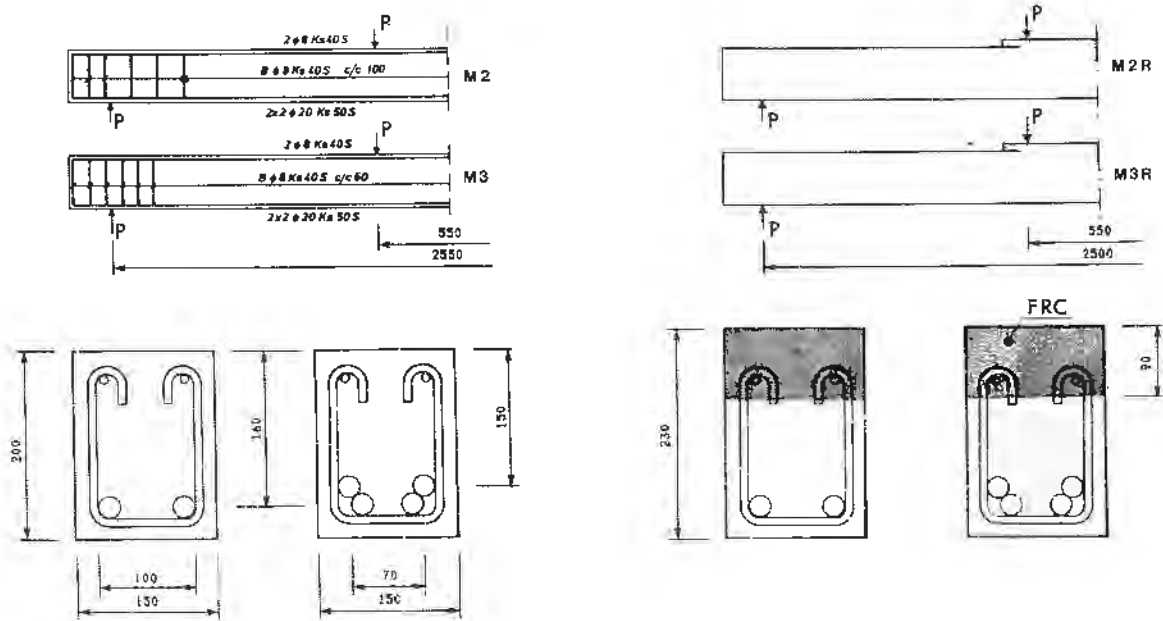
Test beams: a - original beams M2 and M3, b - the same beams repaired marked M2R and M3R.
